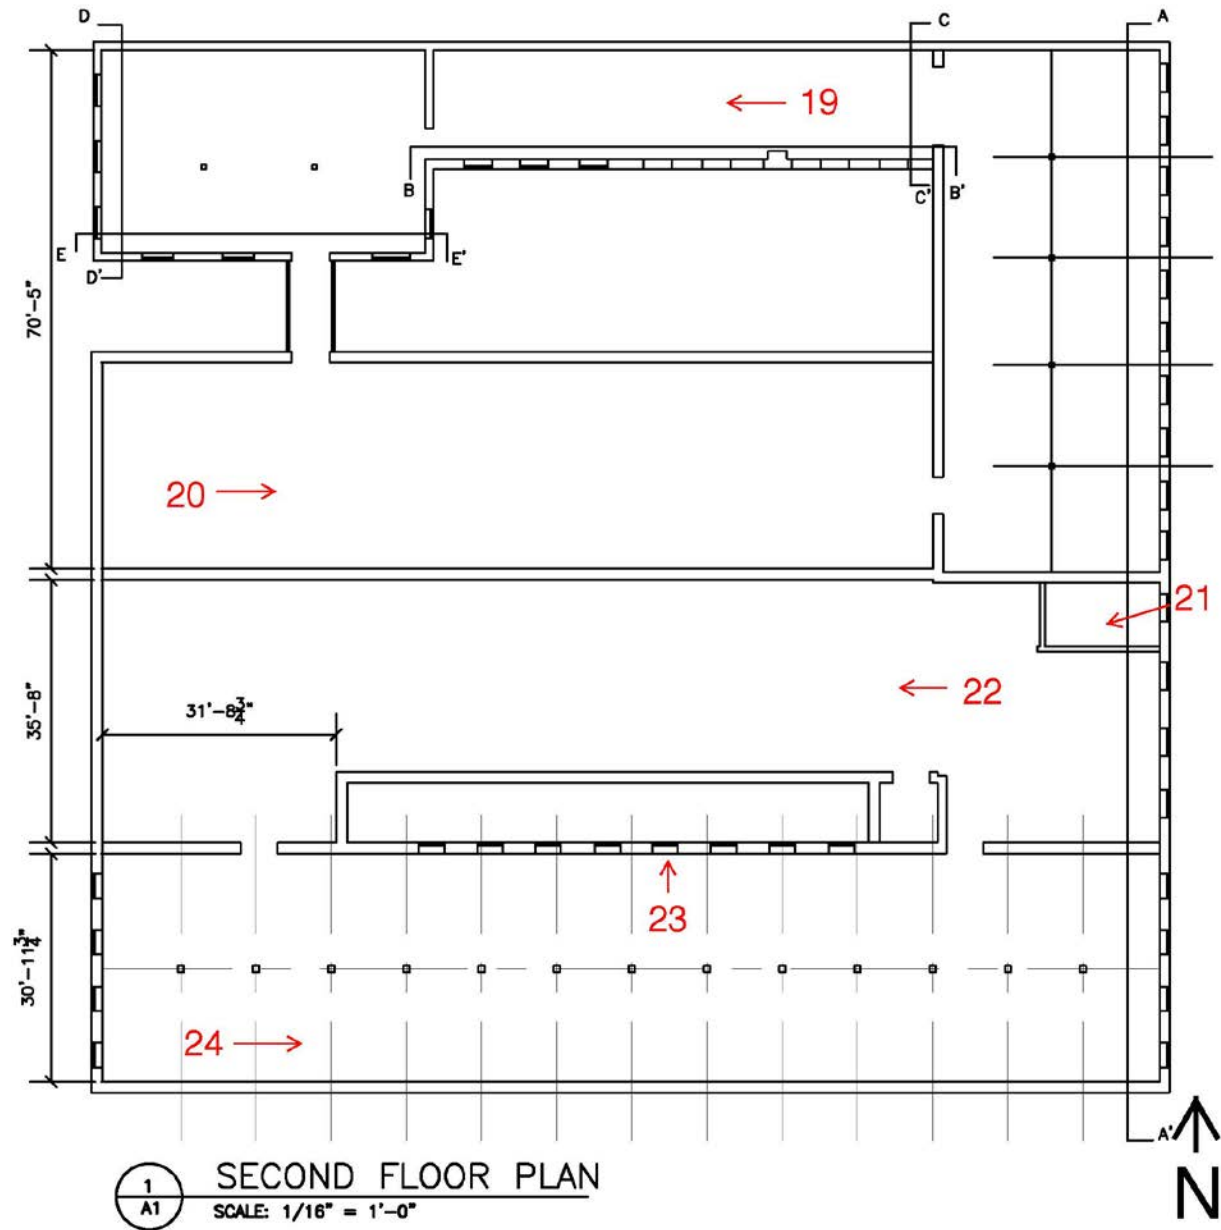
Second Floor Plan, Interior Photo Key 19-24.
